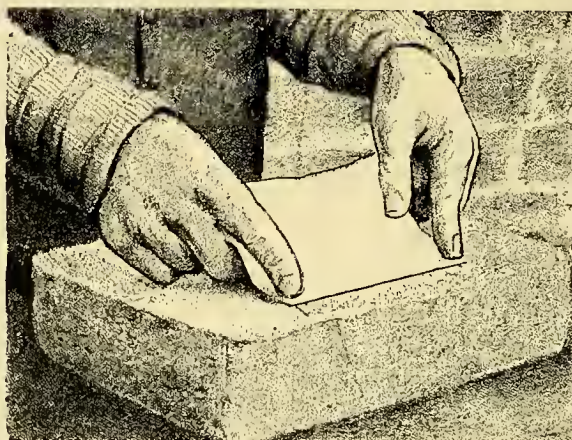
MODE OF HOLDING PAPER WHEN LAYING TO GUIDE LINE DRAWN ON FAR SIDE OF STONE: SHOWING ALSO HOW CORNER AND EDGE OF PAPER ARE ADJUSTED TO MARKS, AND HOW PAPER IS KEPT FROM TOUCHING WORK TILL PROPERLY ADJUSTED.
